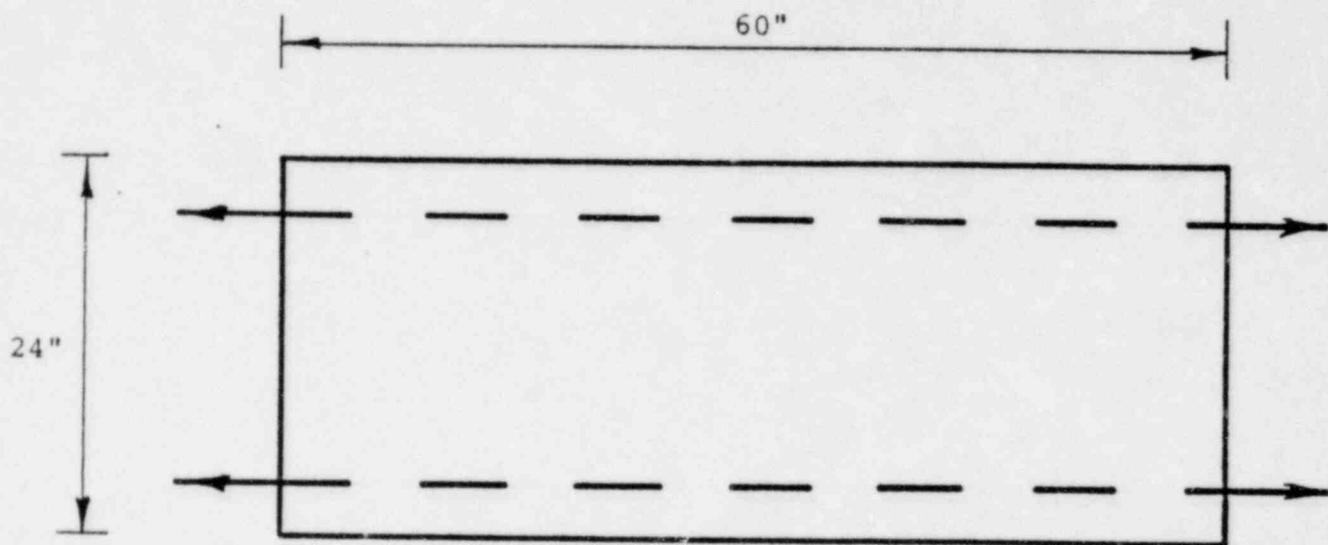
Laboratory Tensile Test Specimen<sup>(13)</sup>
